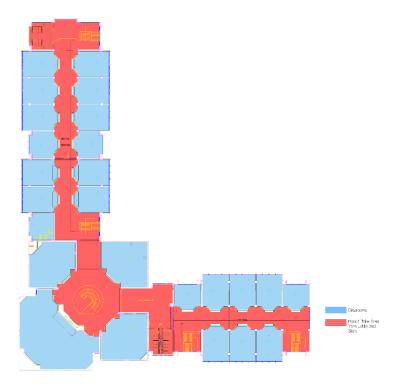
1st Floor Plan of Central Lecture Hall at Eastern Mediterranean University
